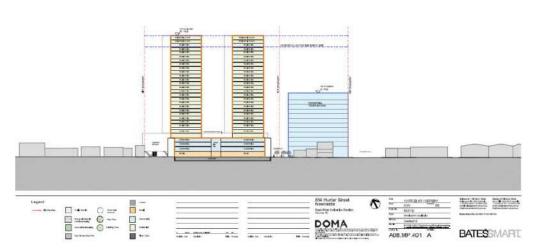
Indicative southern elevation for masterplanned site, showing crosssection of proposed towers. Bates Smart
